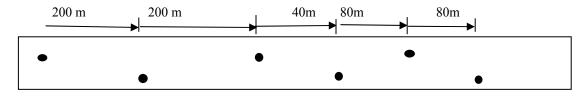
The details of test testing and 200 m section for N4 as well as R301.
